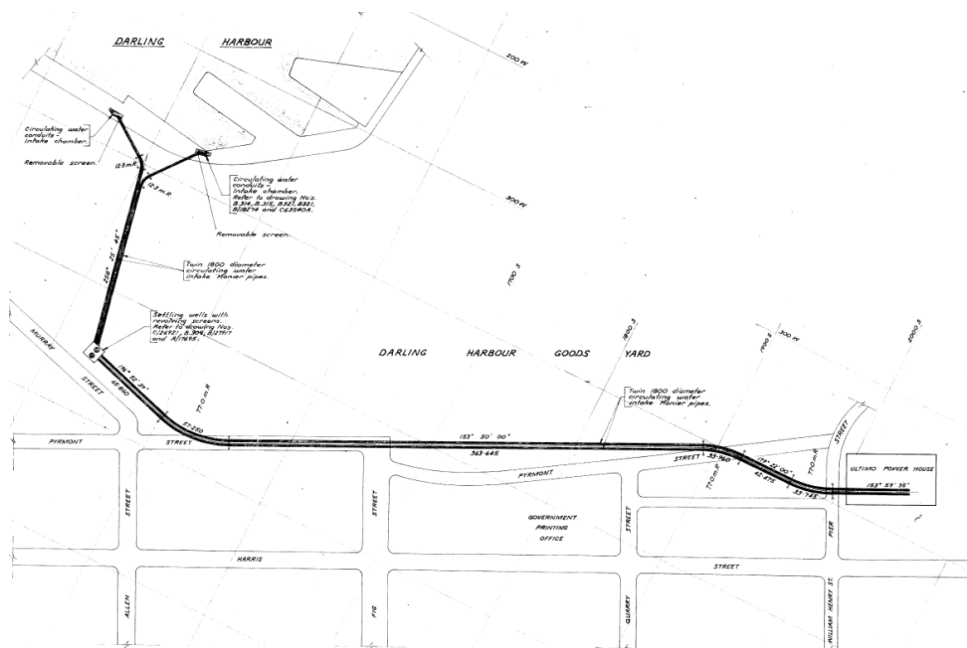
Plan of Powerhouse Seawater Conduits (Source: GAO Plan C82-079G/SC-001, Nov 1982)
